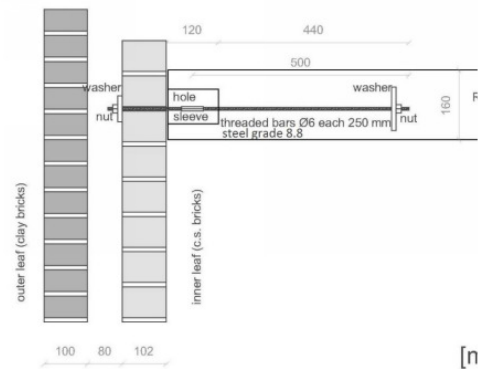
Detail of the connection between the r.c. slab of the first inner leaf (c.s. walls) - East and West side.
